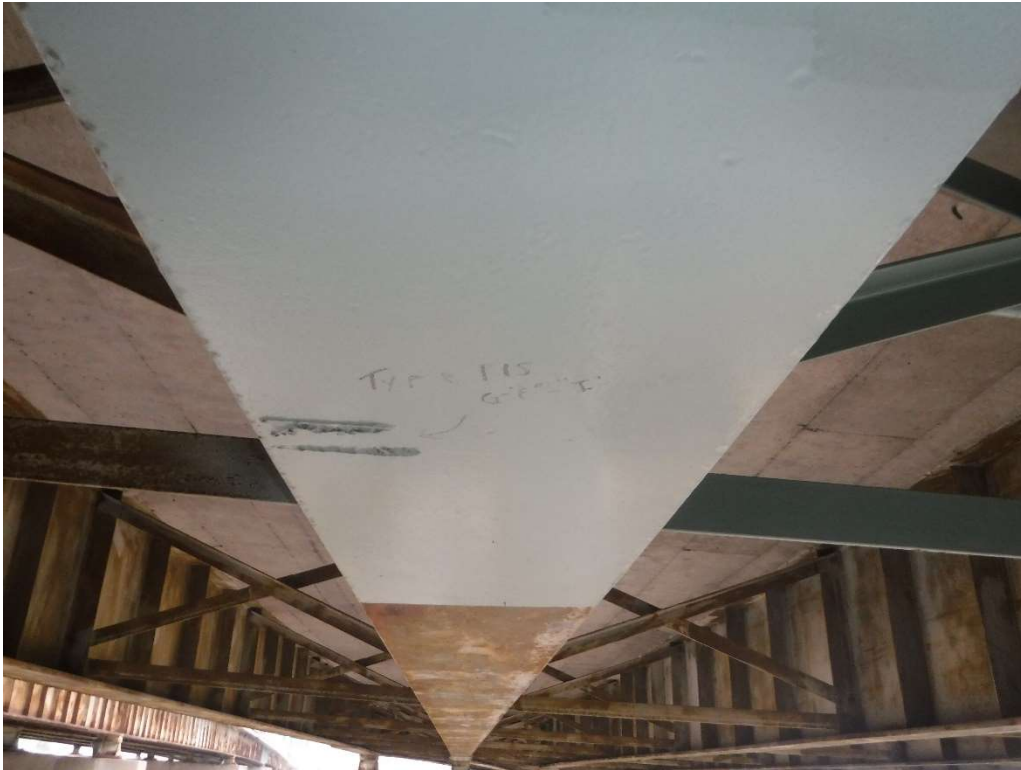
Girder F, Span 16, Typical Weld Remnants on Girders
